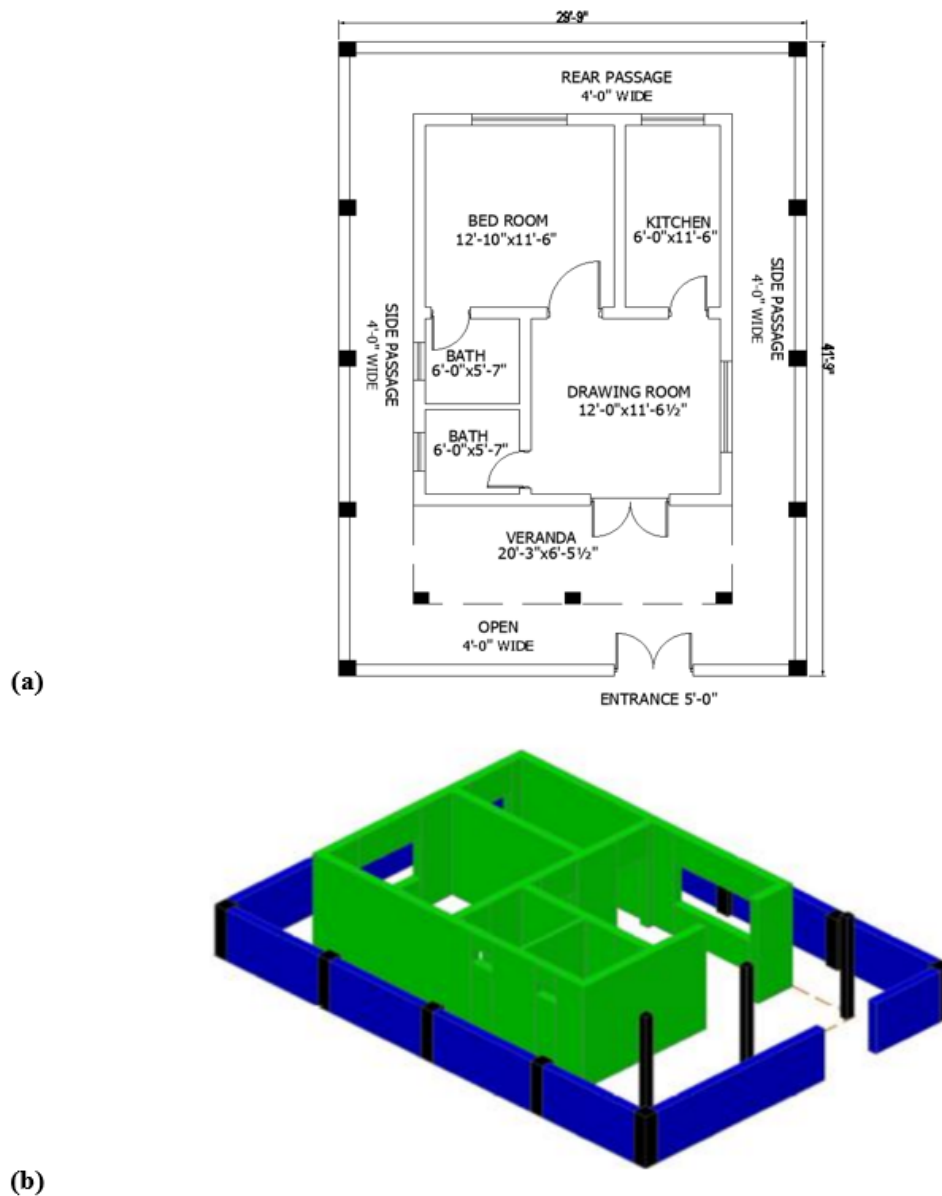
Proposed interlocking plastic-block house: a) plan and b) 3D view
